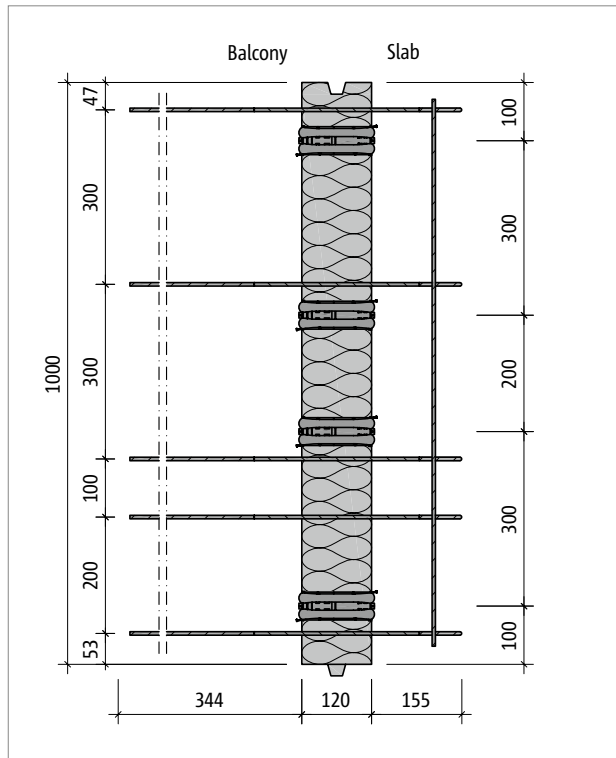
Schöck Isokorb® XT type Q-V1: Product plan view
